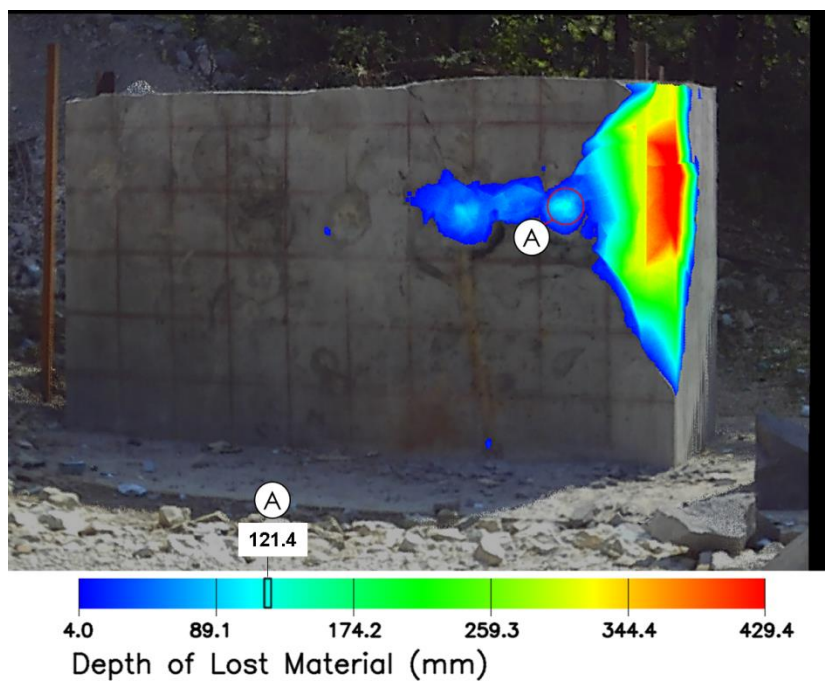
Steel penetrator crater dimensions, 30 lb, test date: 19 Sep 19
